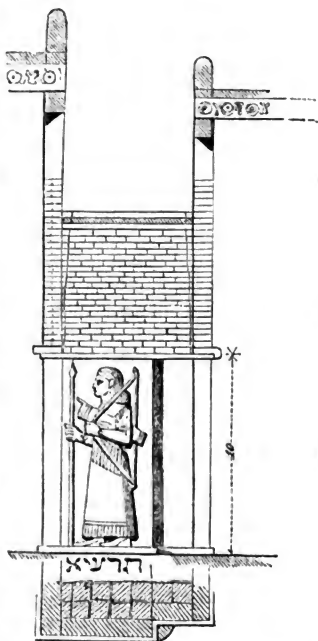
SECTION SHOWING CONSTRUCTION OF WALL AND CEILING.
